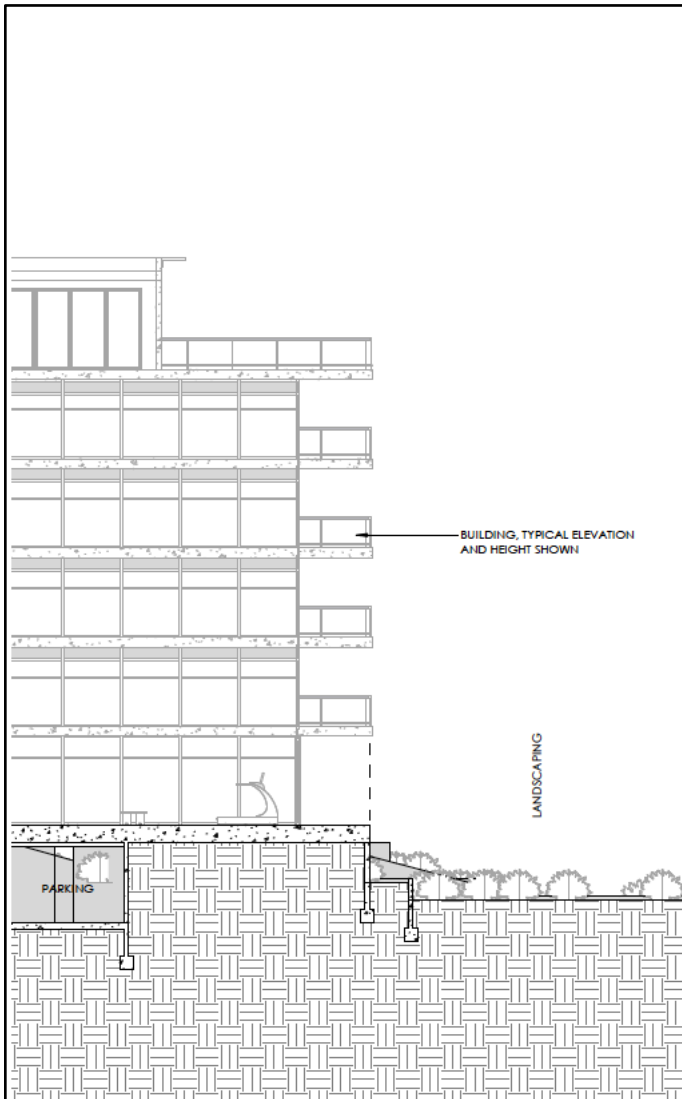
Profile of the proposed site plan detailing the extent of subsurface disturbance.
